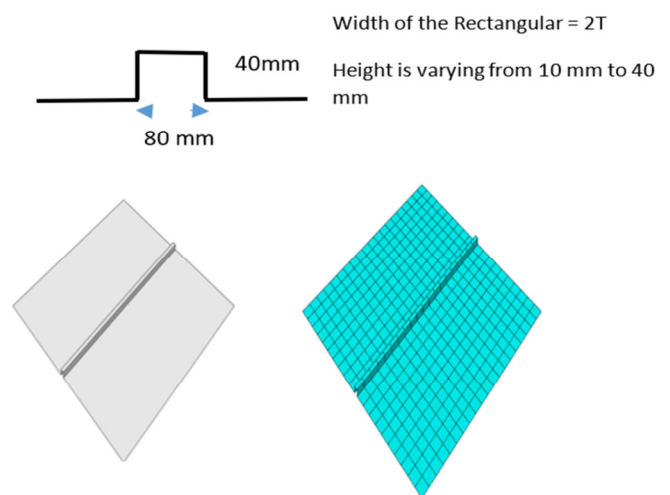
2D section and 3D Abaqus model of the plate with rectangular stiffener.
